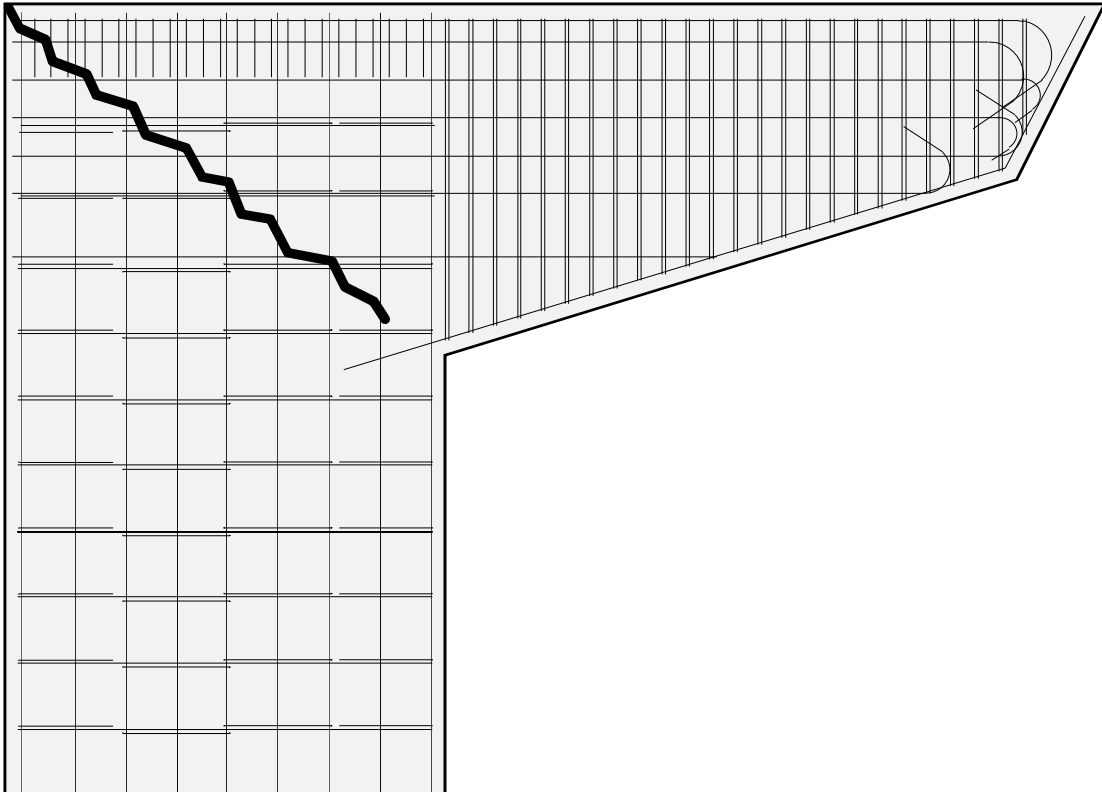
Diagonal Crack at Critical Section in Reinforced Concrete Bent [Modified from Ref. 3]
